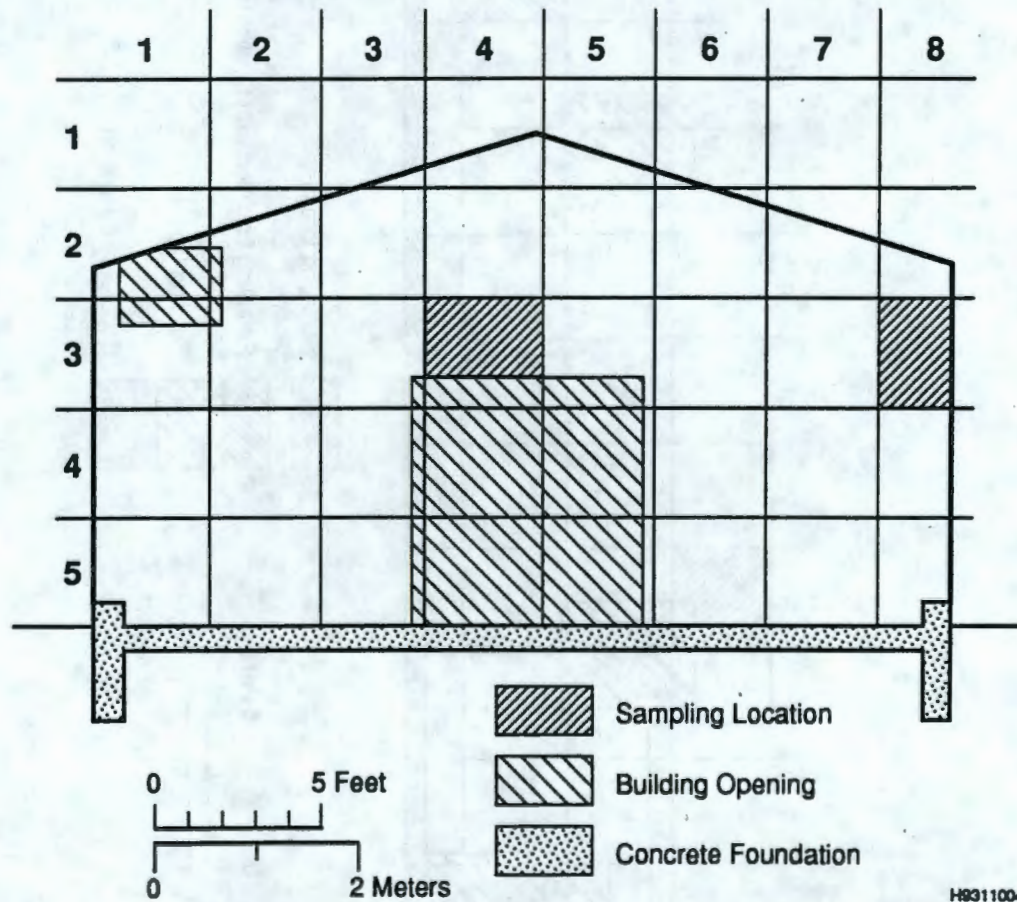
304 Concretion Facility Concrete and Asphalt Sampling Locations.
